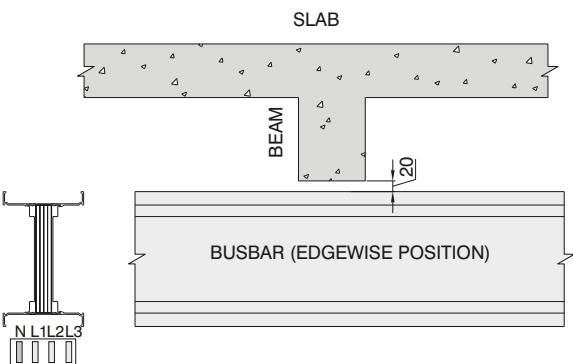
CROSSING UNDER A BEAM EDGEWISE POSITION
